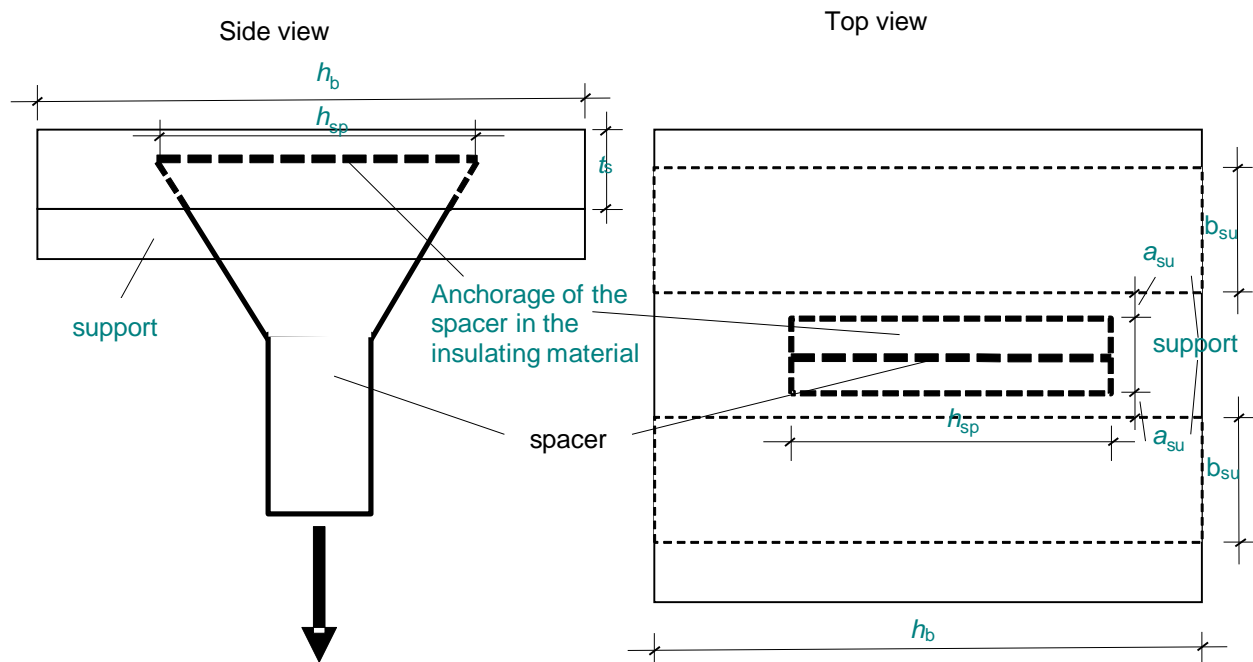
Possible test arrangement with only one side of spacer-leaf connection
